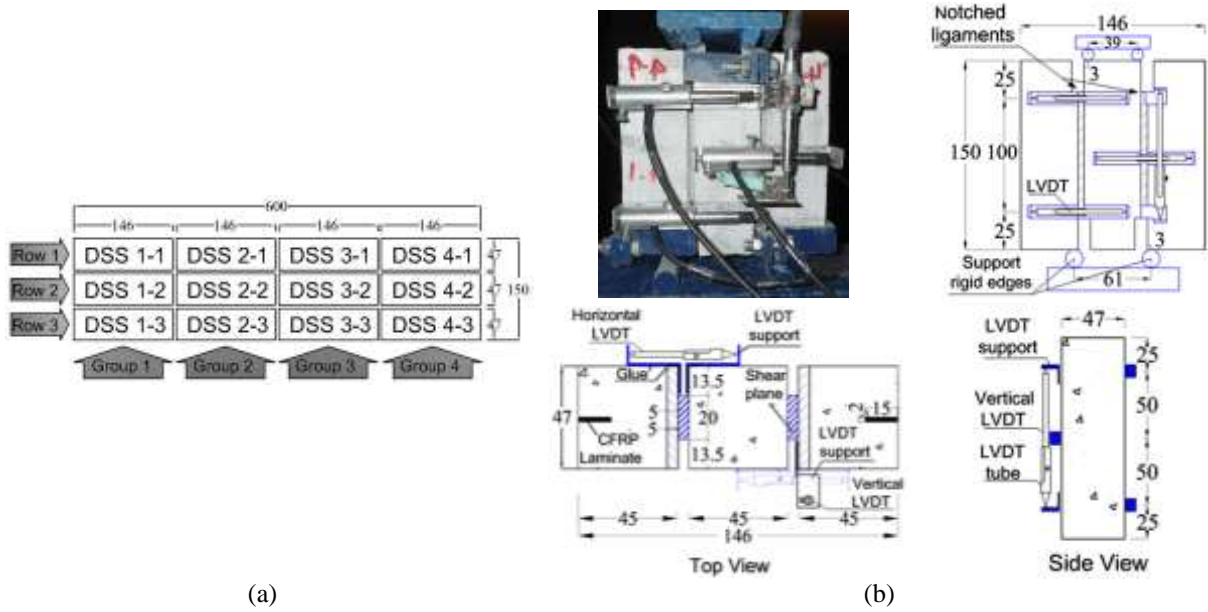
(a) Location of the specimens along the prismatic element (Top view); and (b) geometry and loading configuration of DSS specimen (dimensions in mm)
